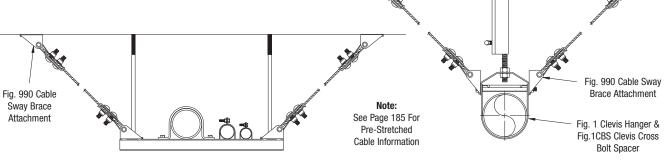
Fast Attach - Cable Sway Brace Attachment
